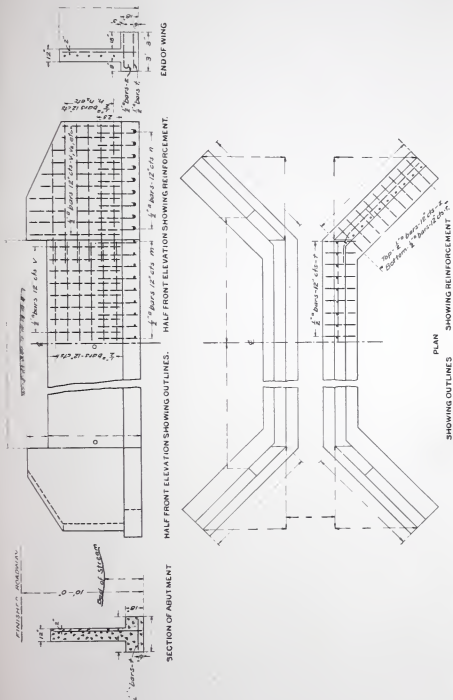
Concrete Sub-structure of 10 feet over all height, Designed by the Illinois Highway Commission.
